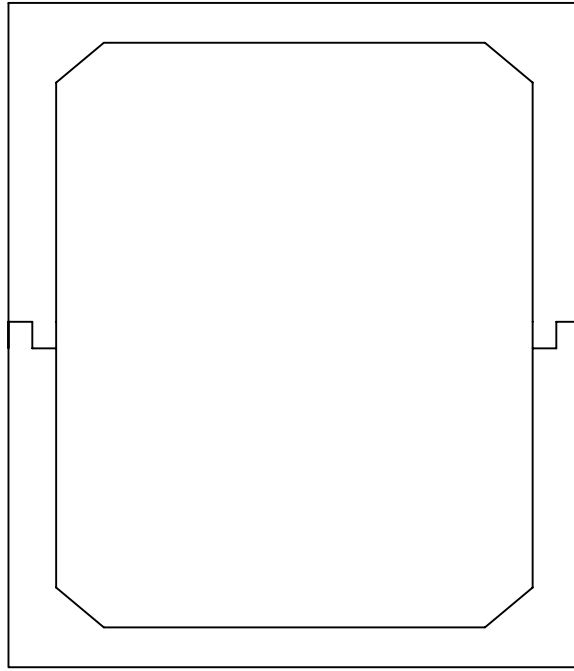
Two Three-sided U-shaped Culverts with a Mid-height Connection Joint
